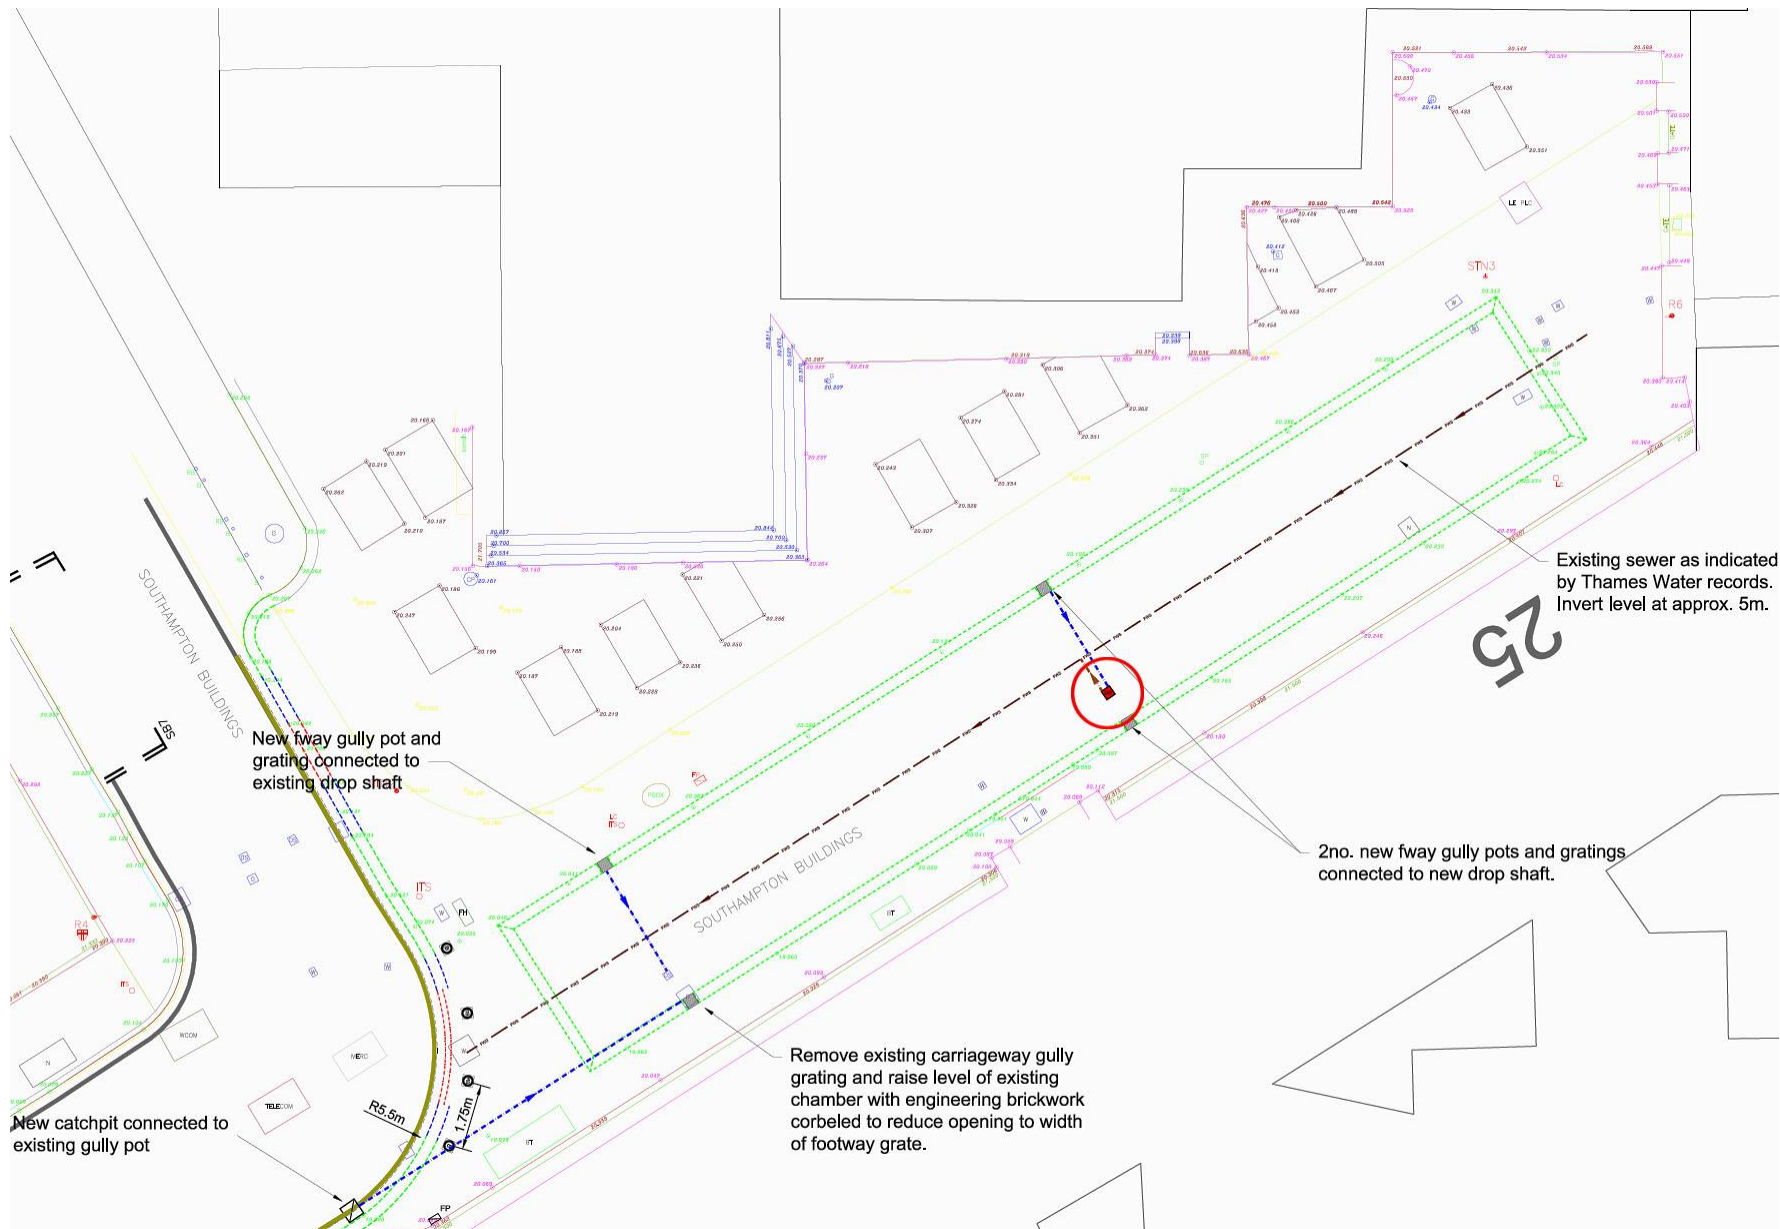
Location of the new dropshaft highlighted on the Drainage Works plan (Dwg No: CoL/SB/DW/01)
